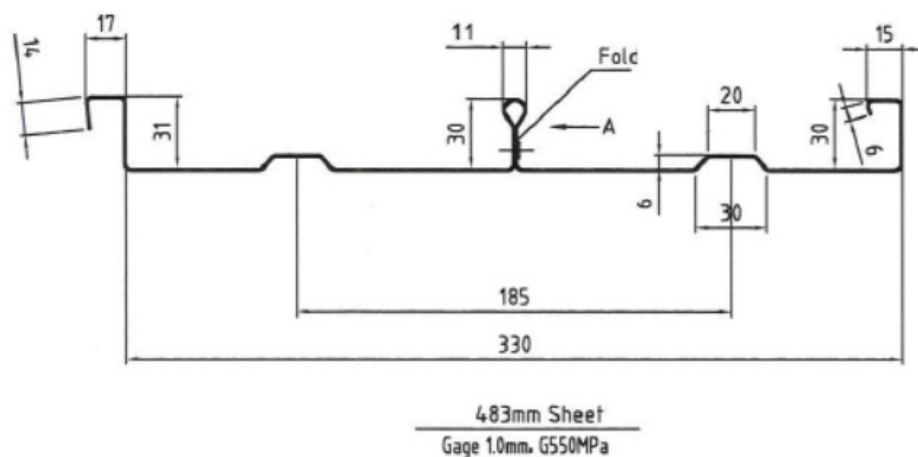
Typical cross-section of PTDeck PT330 BMT1.0 profiled steel sheeting
